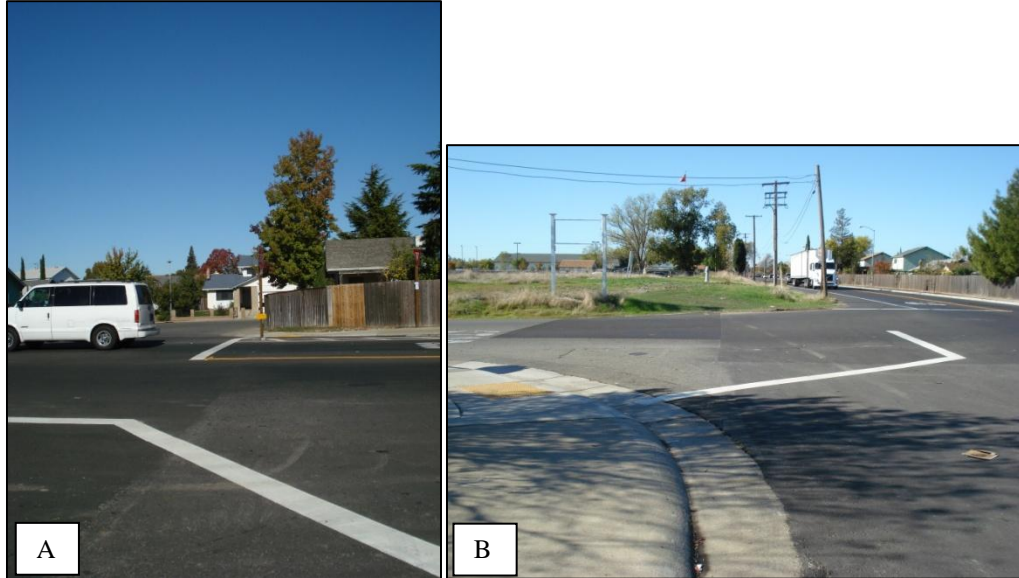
Southeast corner of Elsie Avenue and Iona Way looking north (A) and west (B).
